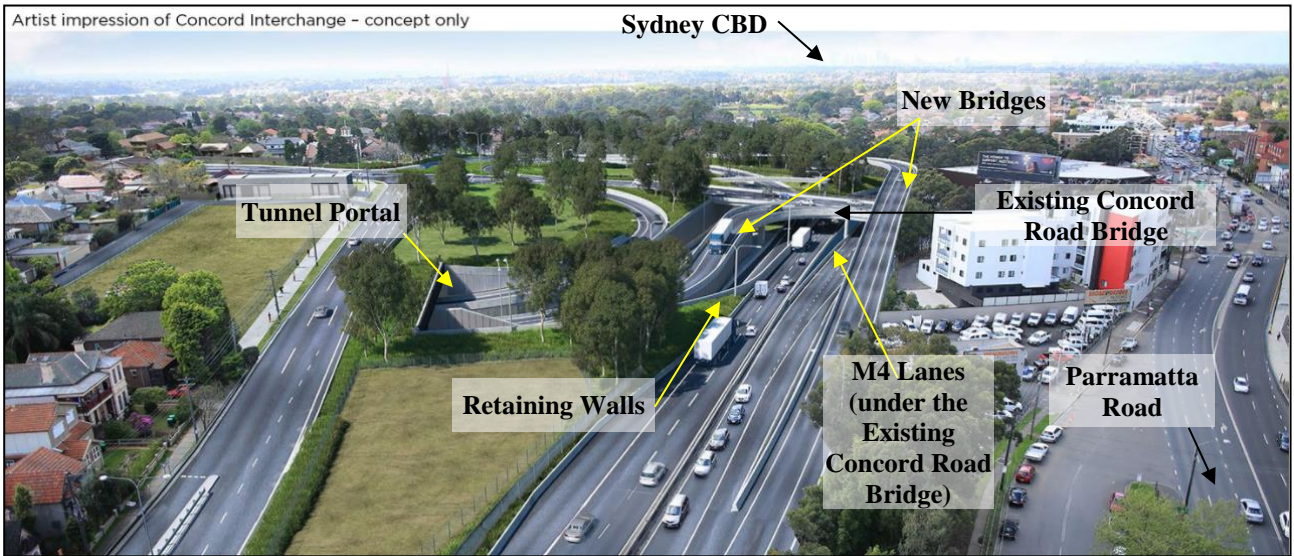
Artist Impression of the Proposed Concord Road Interchange – Concept
